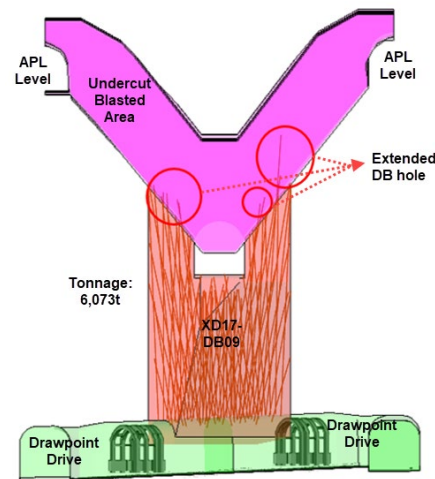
The plan and long section view of ring dump adjustment at P0 drawbell
